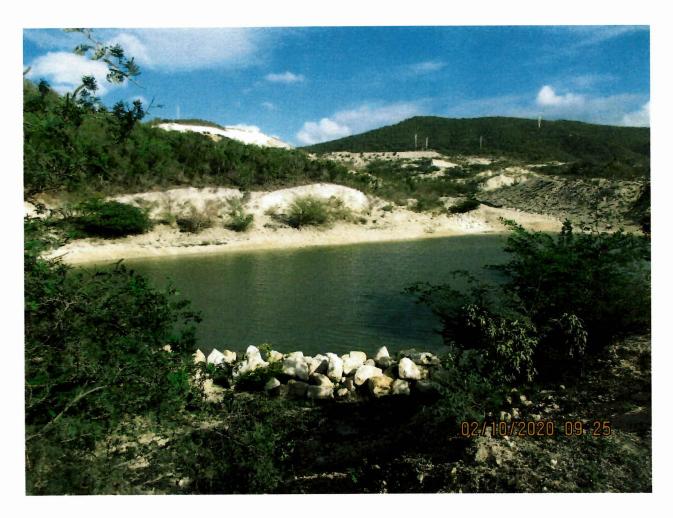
Panoramic view of sedimentation pond inlet showing additional stormwater holding capacity.
